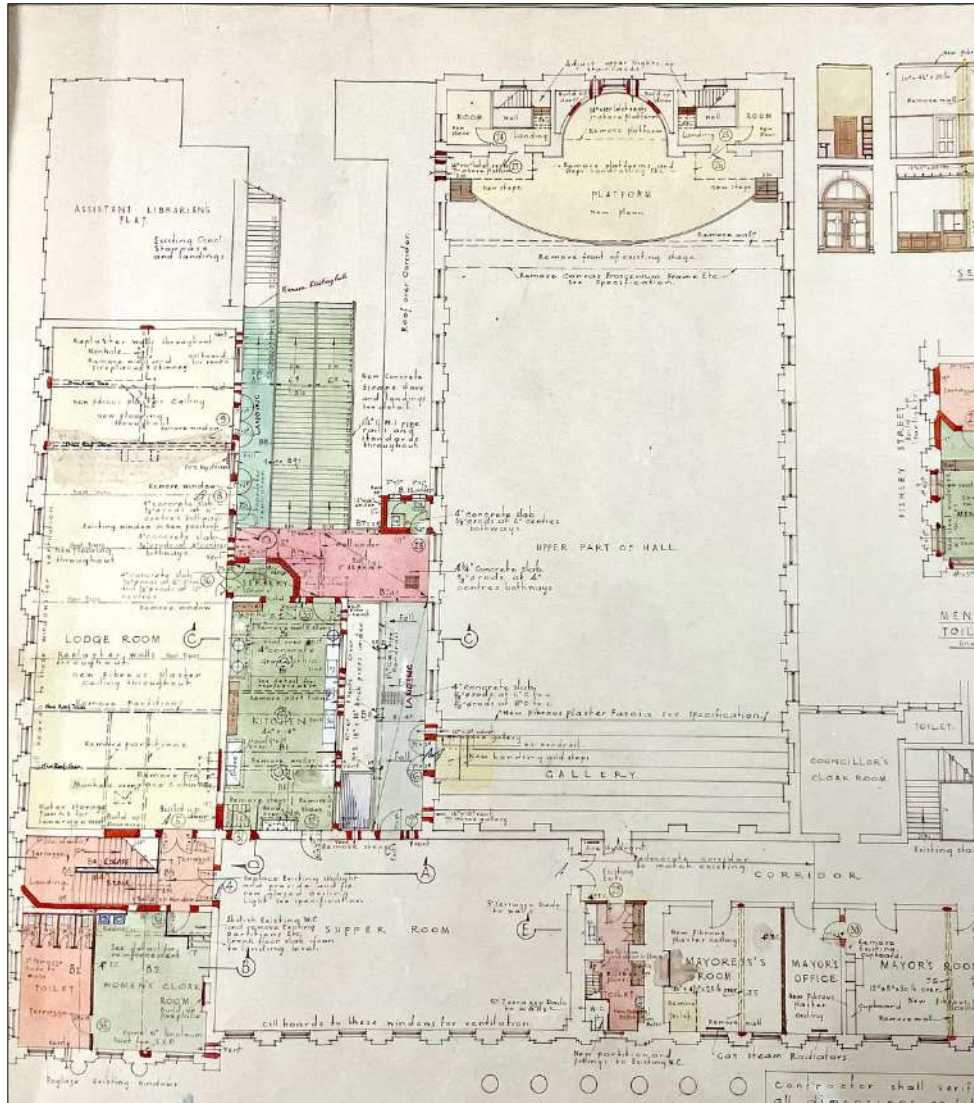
1937 first floor plan by Oakley & Parkes showing refurbishment of various interiors including the former Mechanic's Institute lodge room, toilets and cloak room at the south-west corner, and new kitchen to the north of the supper room. Note also the new external concrete stairs in the courtyard to the west of the main hall. Source: Public Records Office Victoria.
